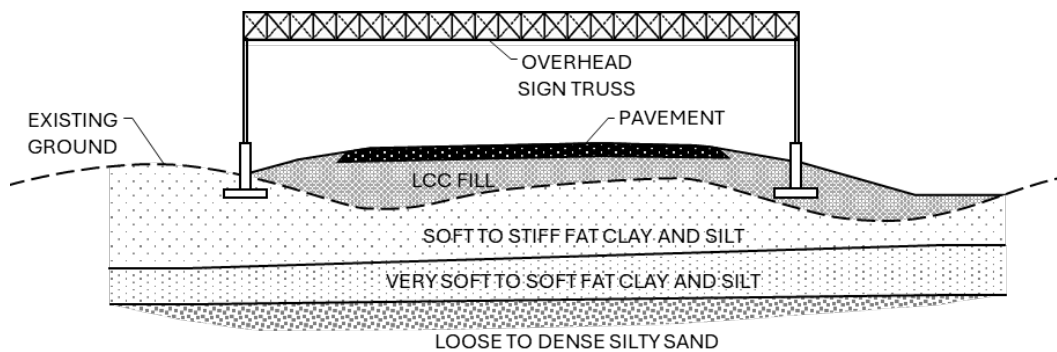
Typical cross-section of embankment (redrawn from Iowa DOT design plans).
